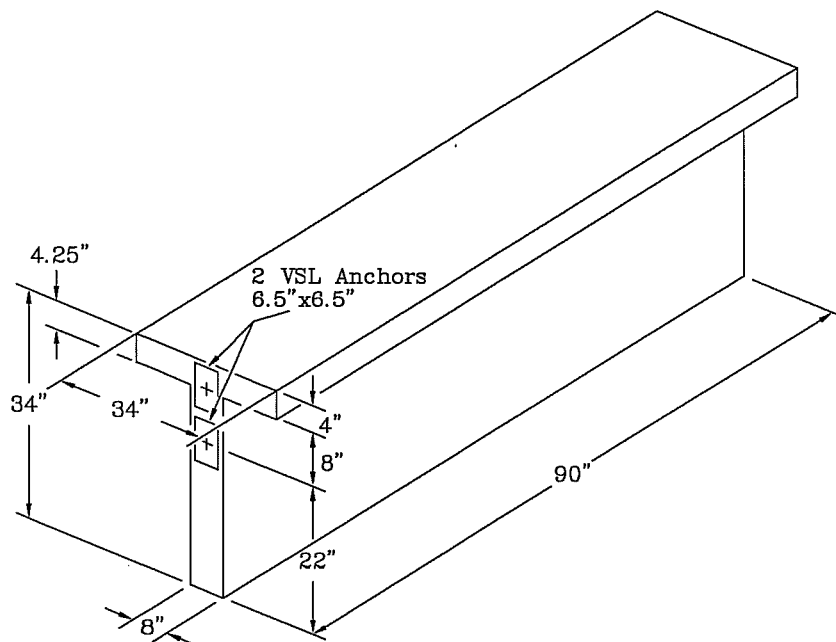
Geometry of Specimen F with Anchorage Zone in a Flanged Section
